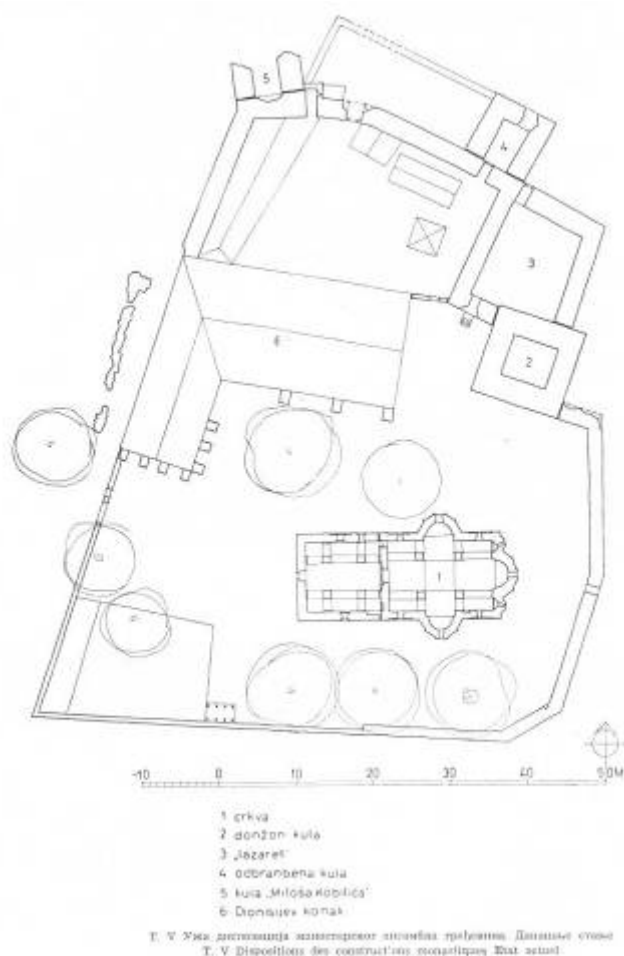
Ground floor of the site before the archaeological excavations (1966)
